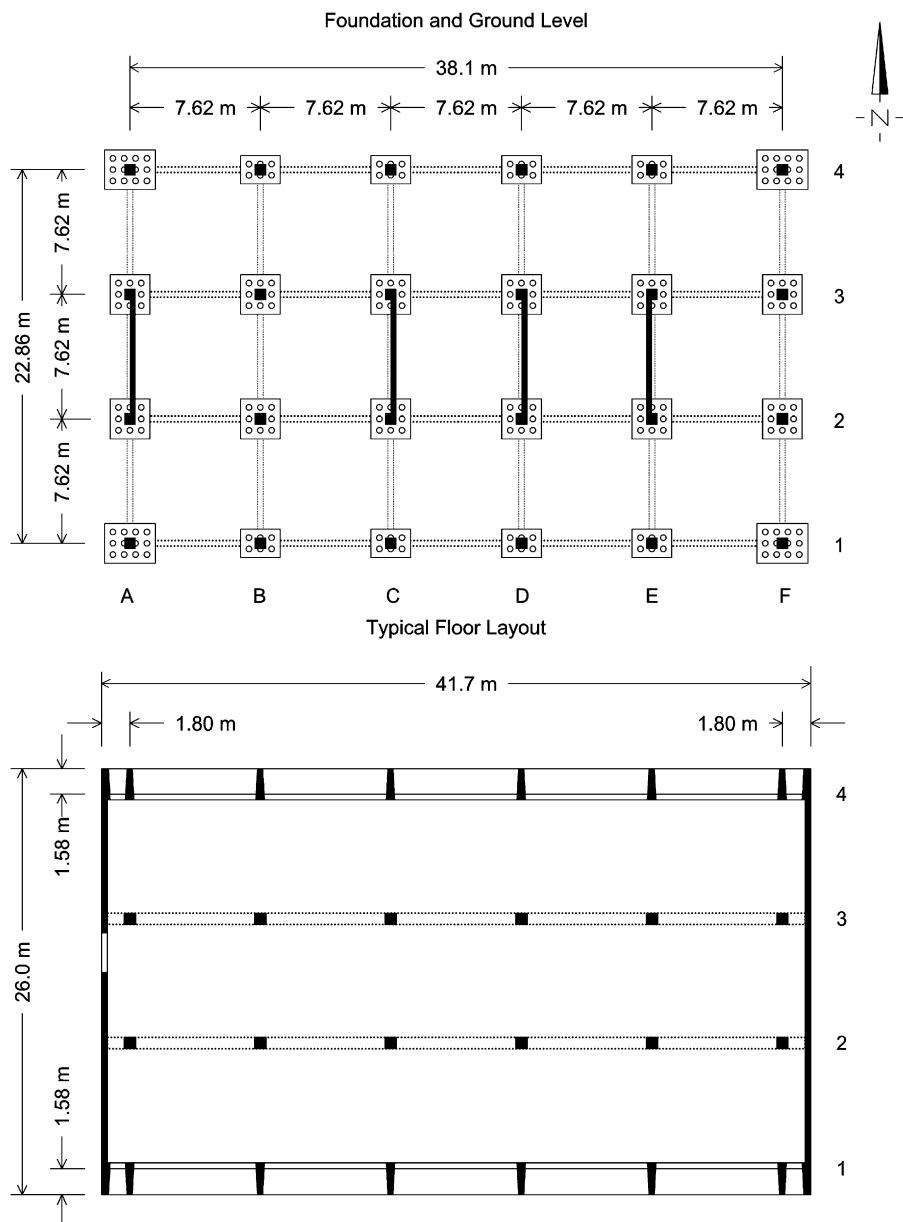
Foundation and ground level plan (top) and typical floor layout (bottom) of the ICS Building.
